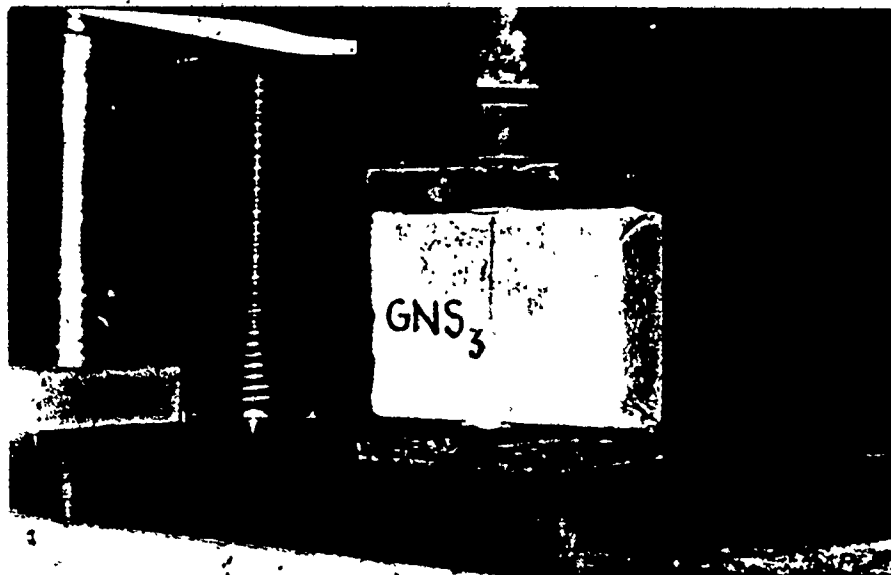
SPLITTING TEST OF A BLOCK MOULDED PRISM
